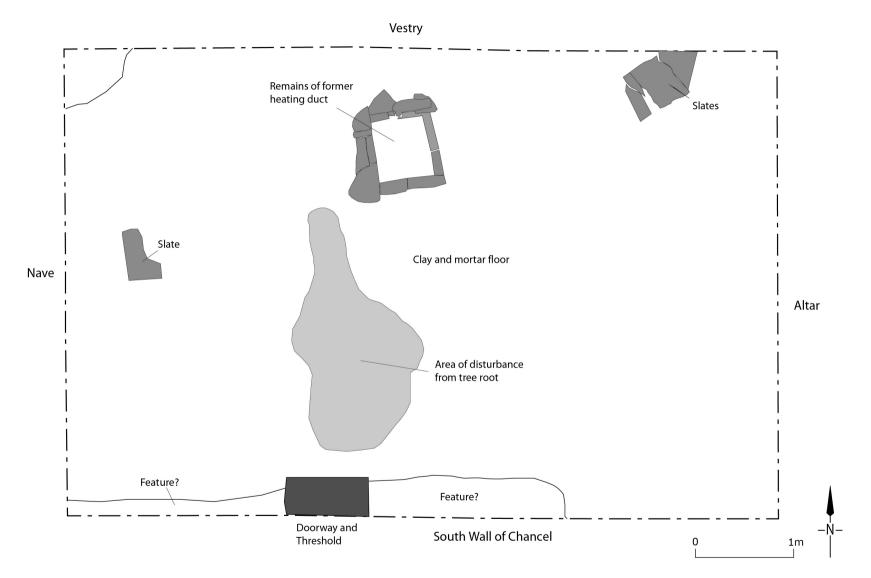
Plan of Chancel Floor following removal of concrete floor and rubble
